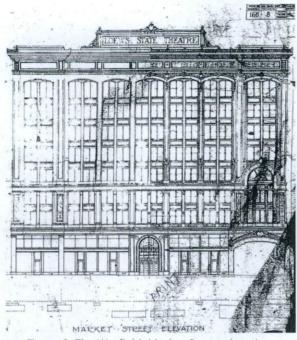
The Warfield. Market Street elevation (1 September 1920).
